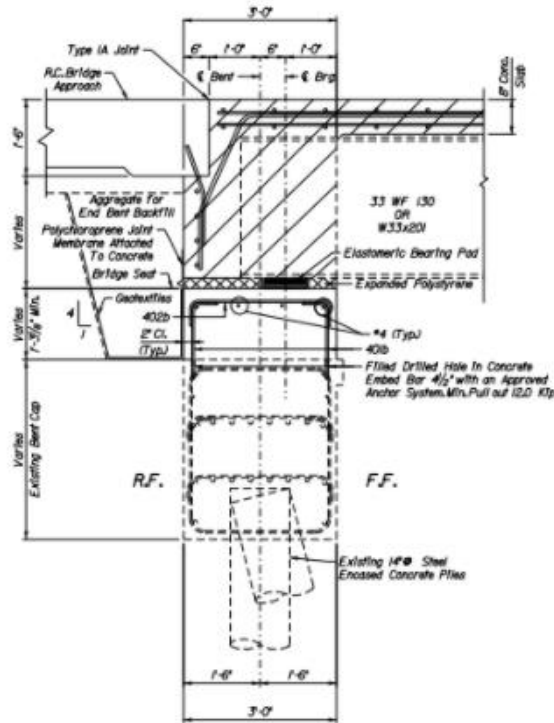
Abutment Detail of the Bridge (NBI 49120) (2012)
